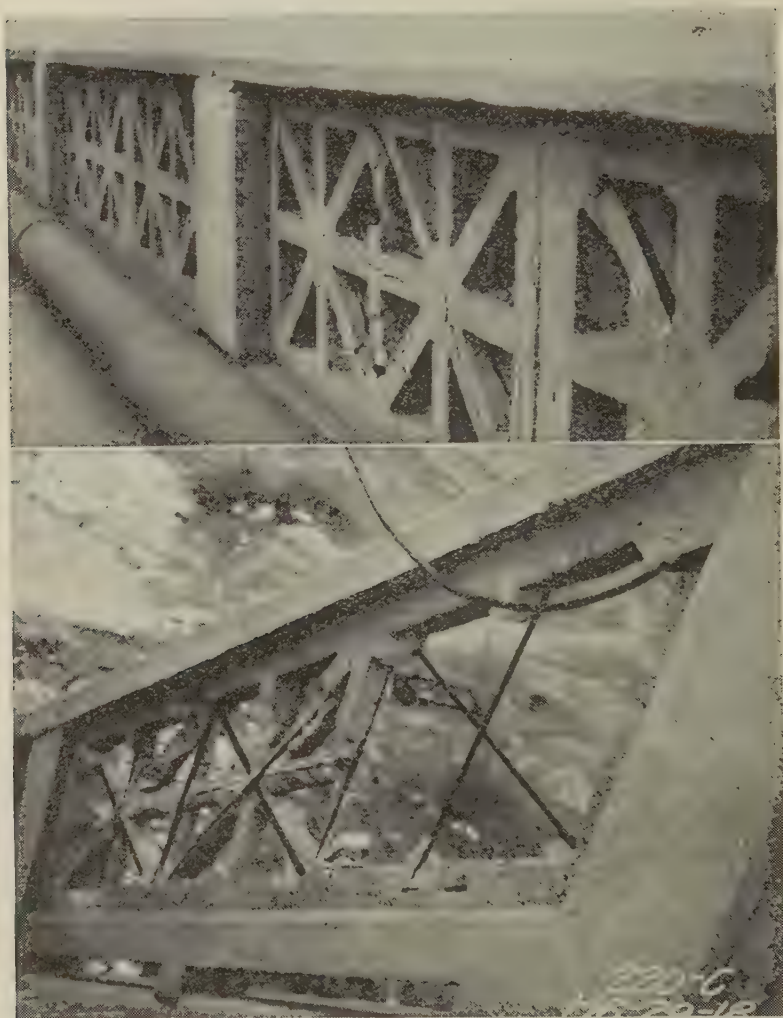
THE CONCRETE WAS SPALLED BY THE CORROSION OF REINFORCING BARS ALONG TWO MILES OF THIS BRIDGE RAILING. WHERE PROPER PROTECTION WAS GIVEN, AS IN THE LARGE POSTS, THE CONCRETE WAS NOT AFFECTED
